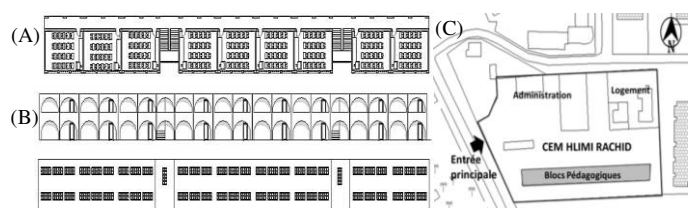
Presentation of the reference building: (A) plan view, (B) North and South facades , (C) pedagogical block situation, Source: authors (2019).
